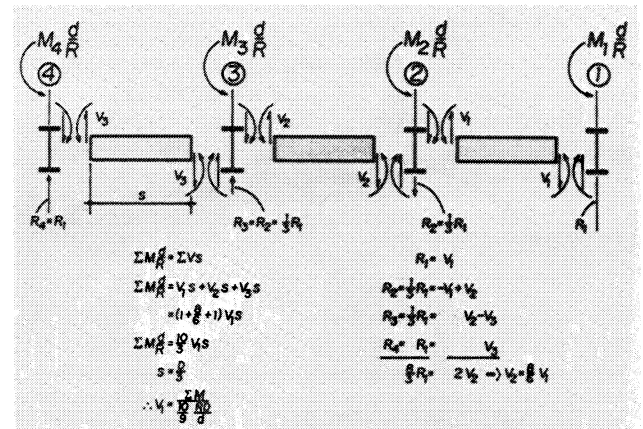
Cross-section of a four-girder bridge—moment equilibrium
